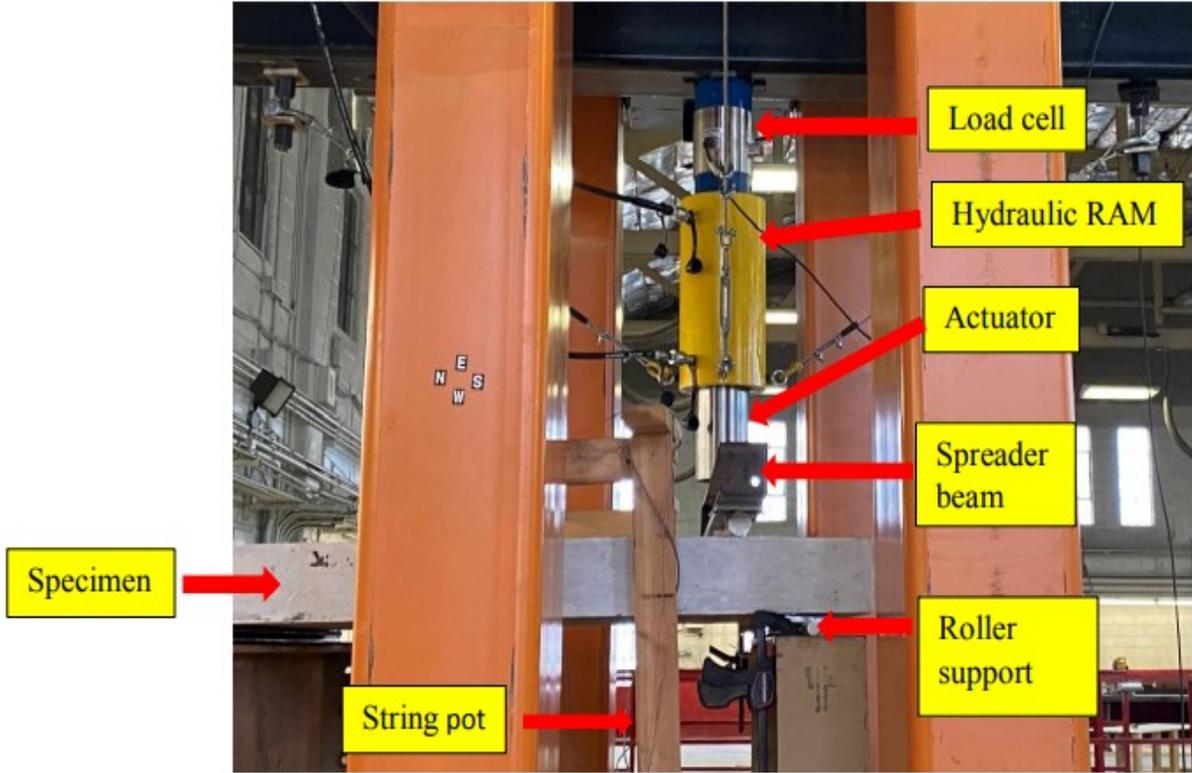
Test setup used to conduct the shear test of slab specimen (East side)
